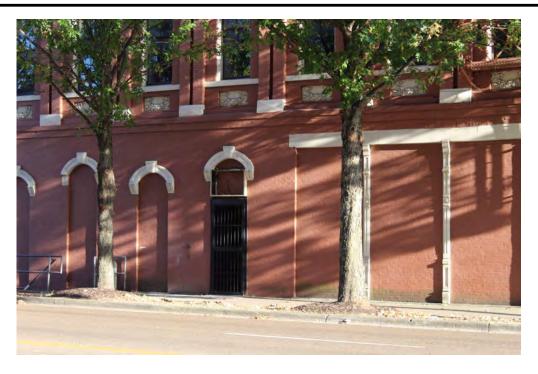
Project area at northwest elevation, 82 Commerce St., 10/24/2024
